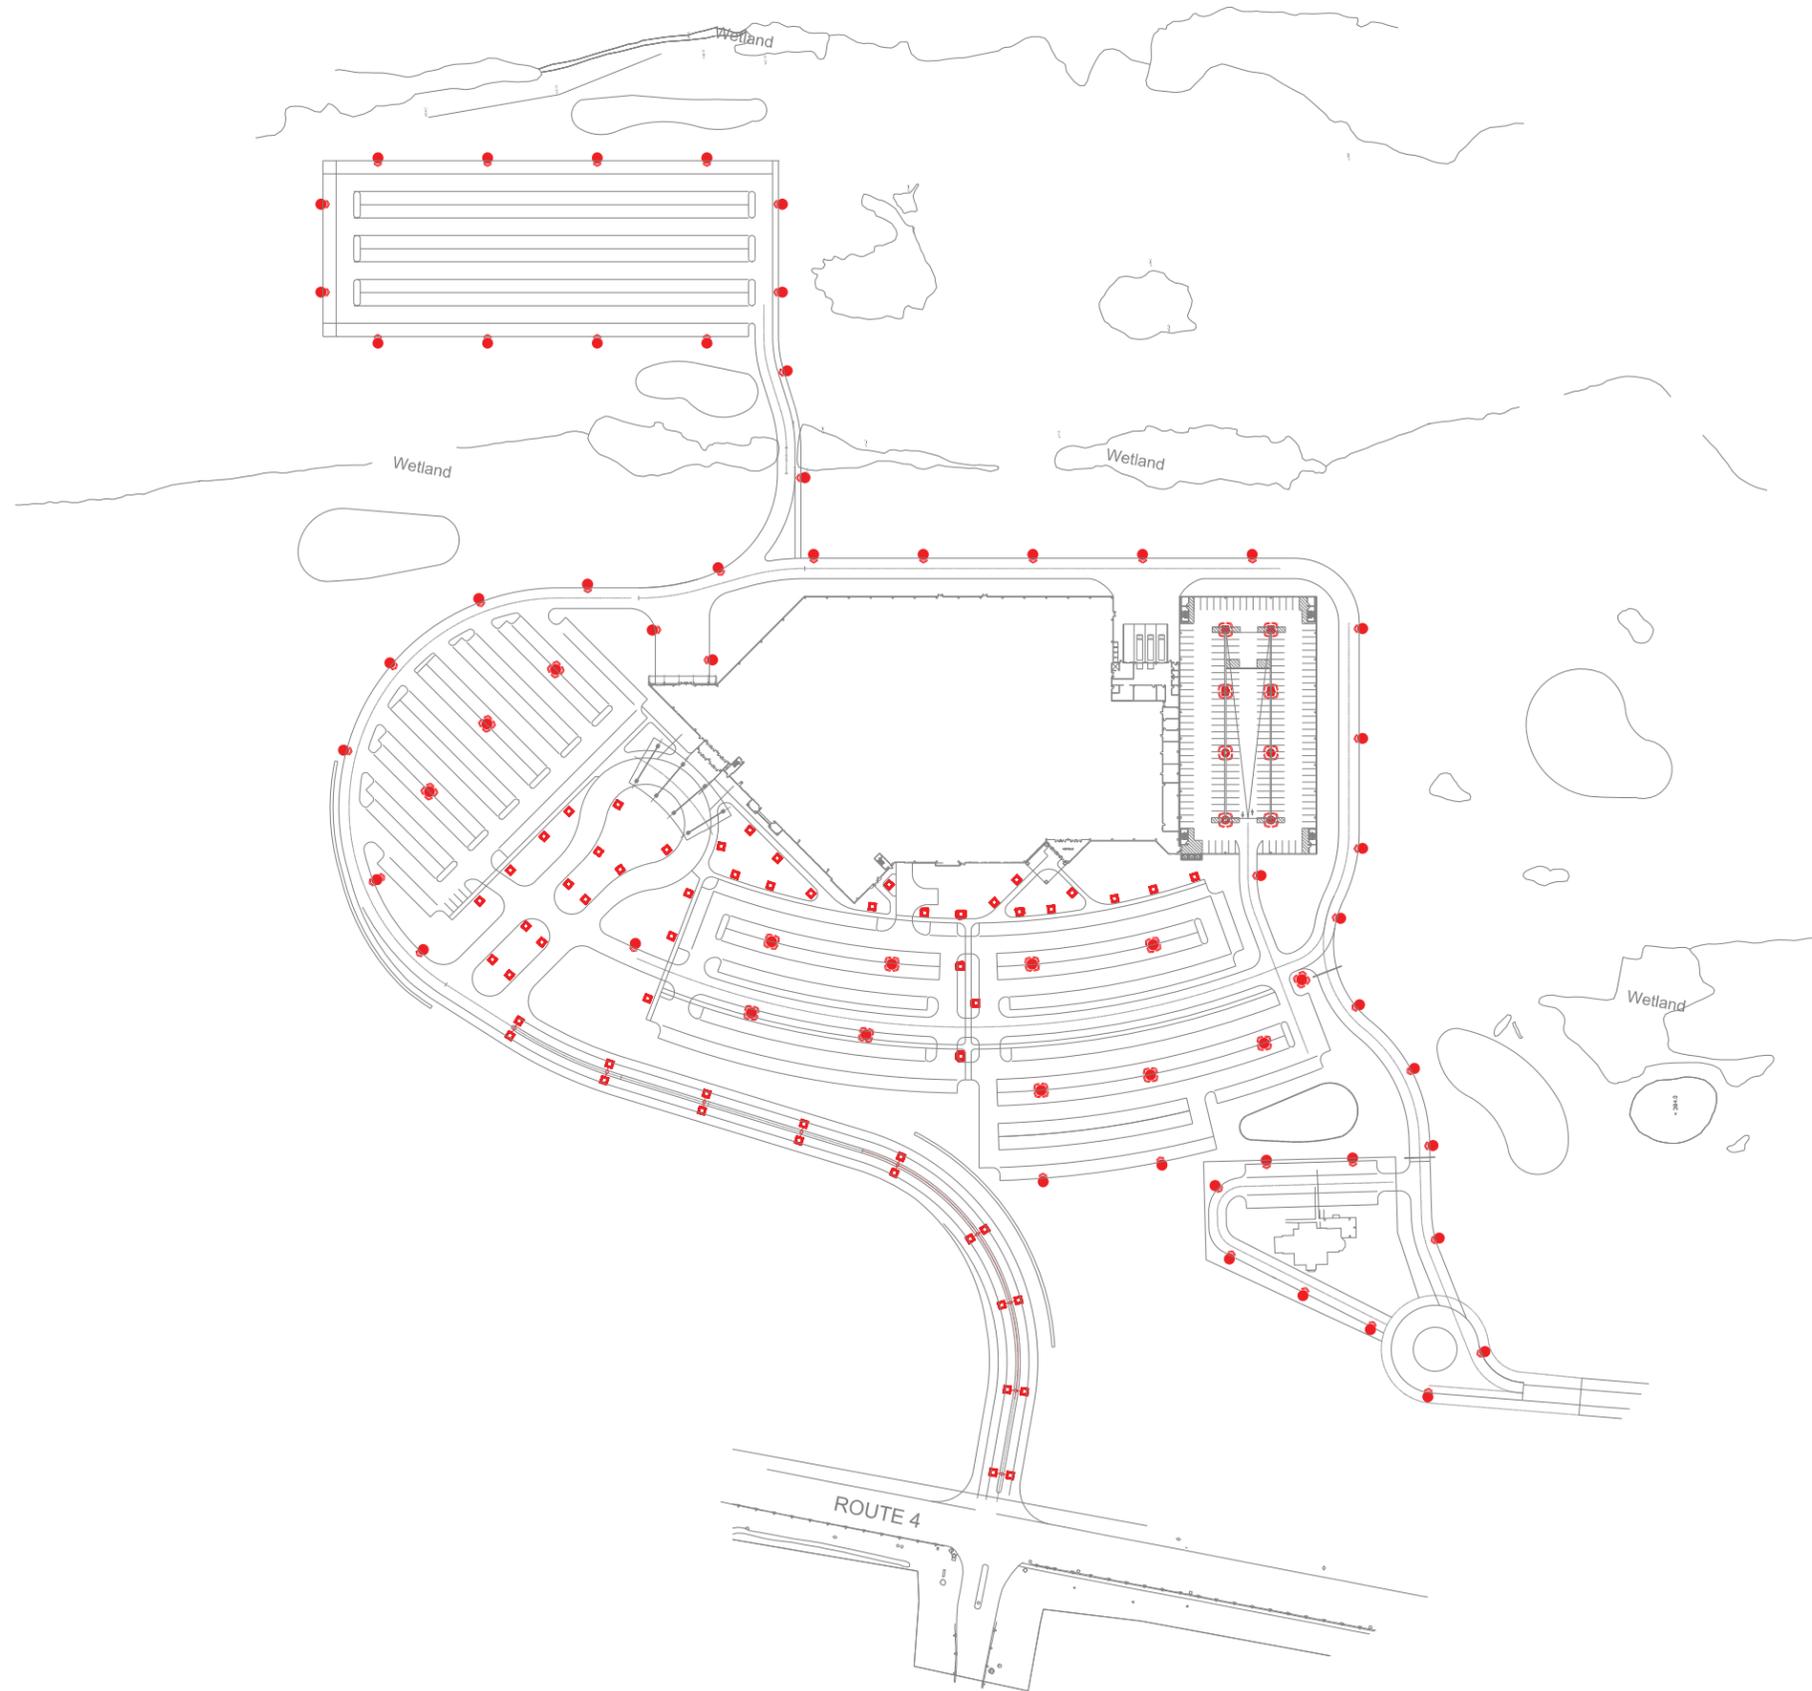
a.6 – Exterior Lighting Design
